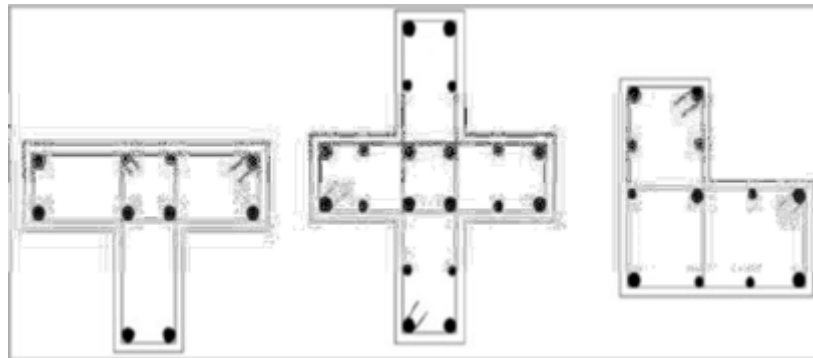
Specially shaped (T, Plus, L) columns with Longitudinal and lateral reinforcement
